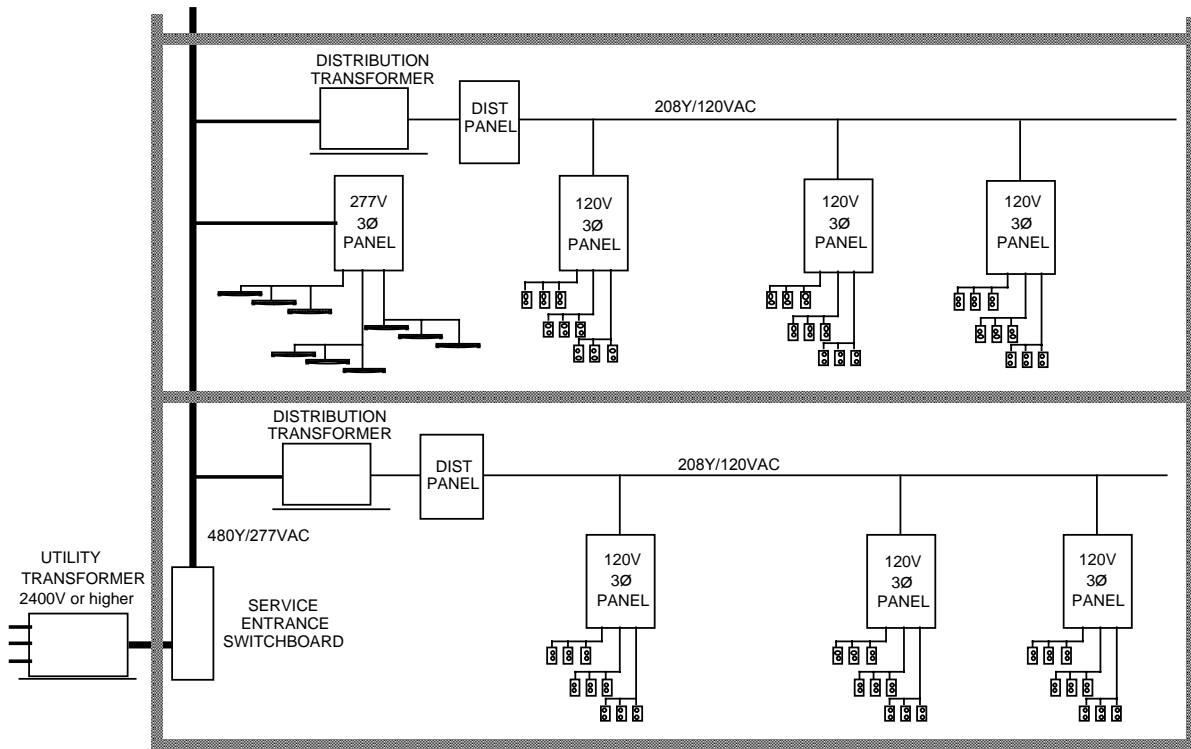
Electrical Wiring Detail in a Typical North American Commercial Building
